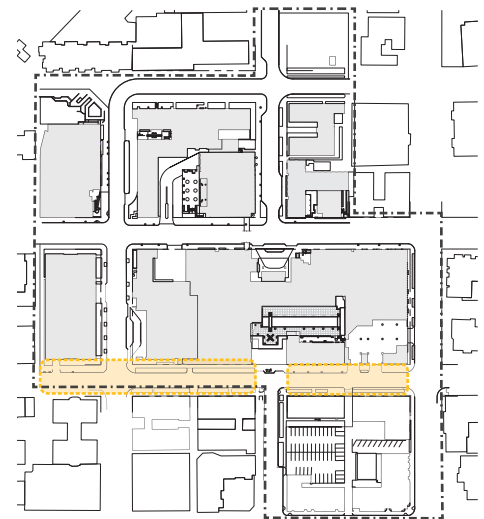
SPRING STREET PROPOSED PLAN EAST
